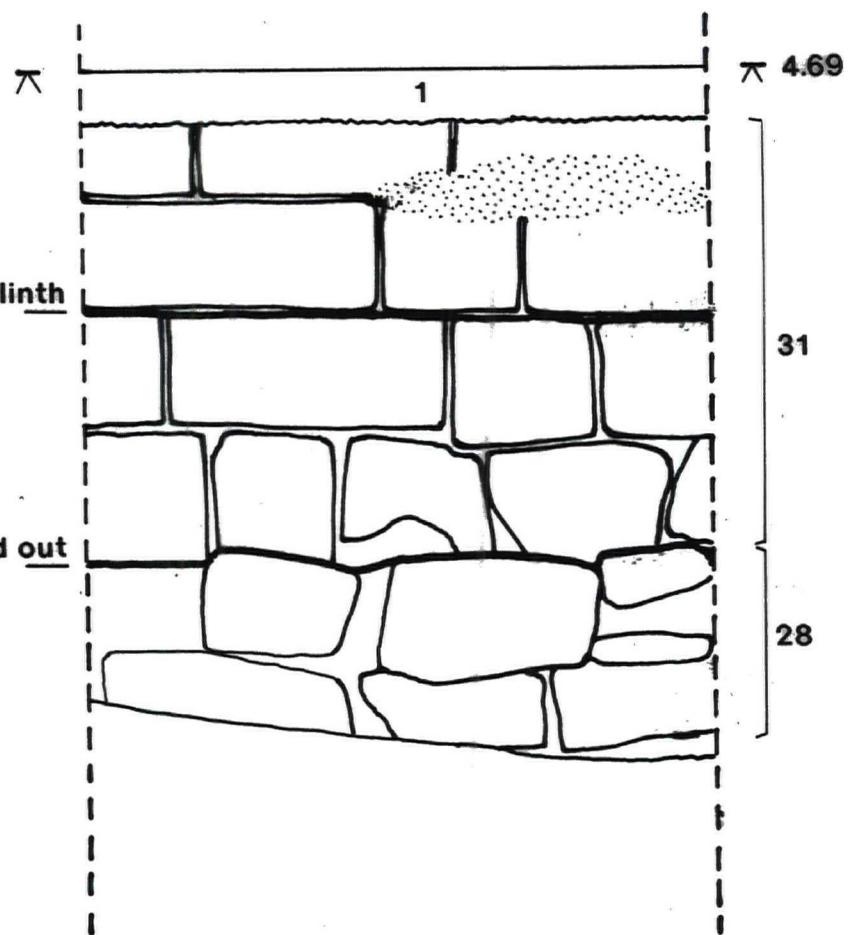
TRENCH 1. E. & S. FACING SECTIONS
